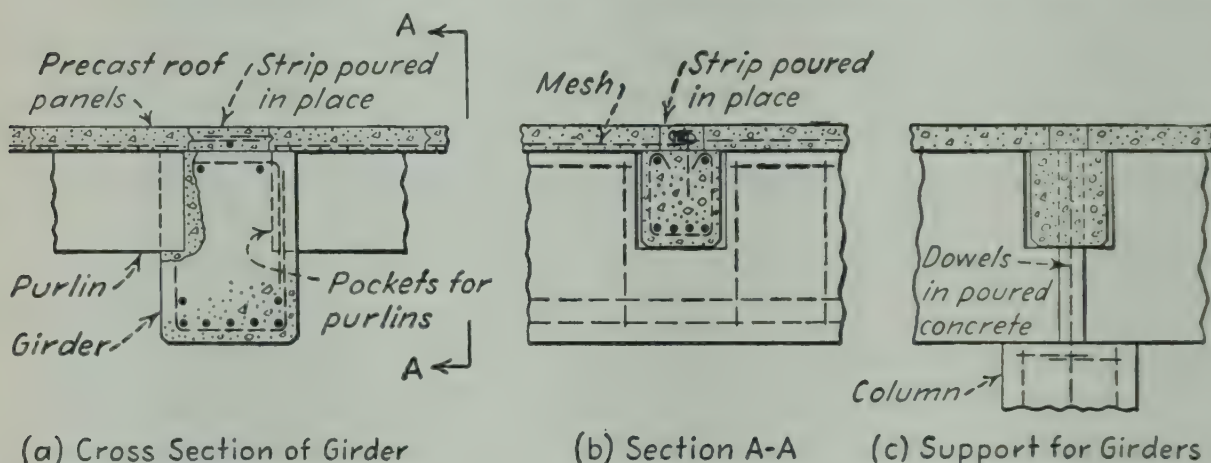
One type of precast-concrete construction for a factory roof.
